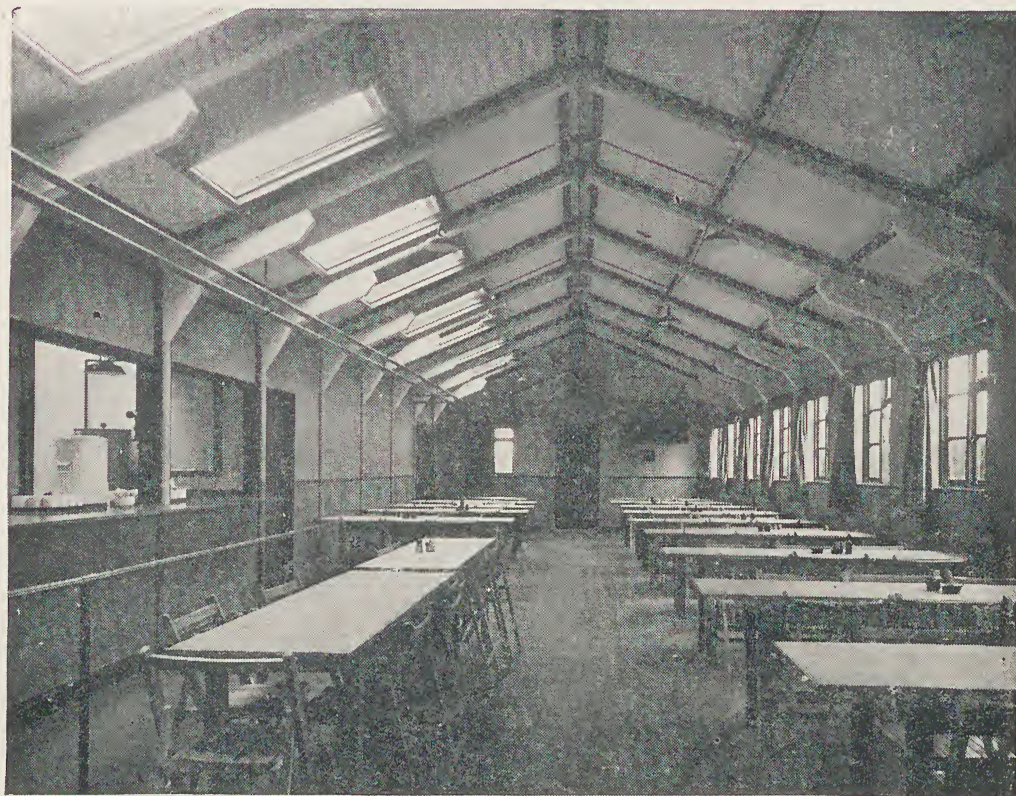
Canteen interior. Pre-cast concrete units, 30 feet 6 inches span.
